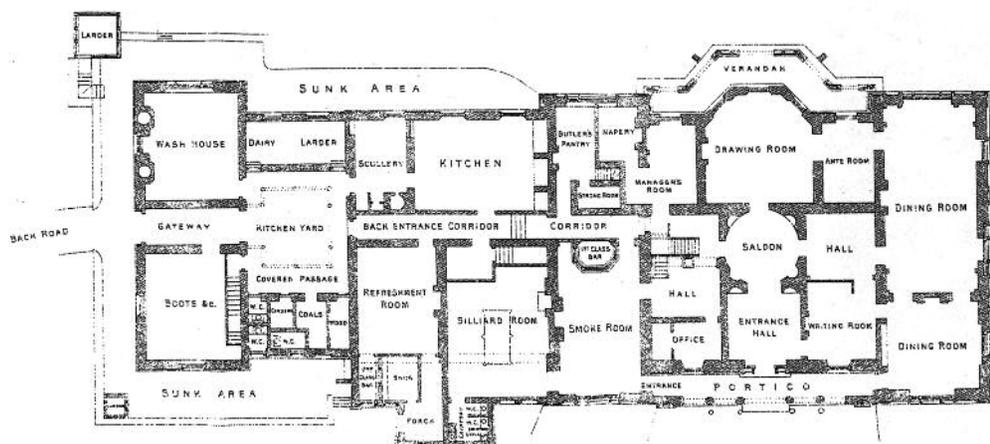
Ground-floor plan of Storrs Hall Hotel from Particulars of Sale, 1900.
